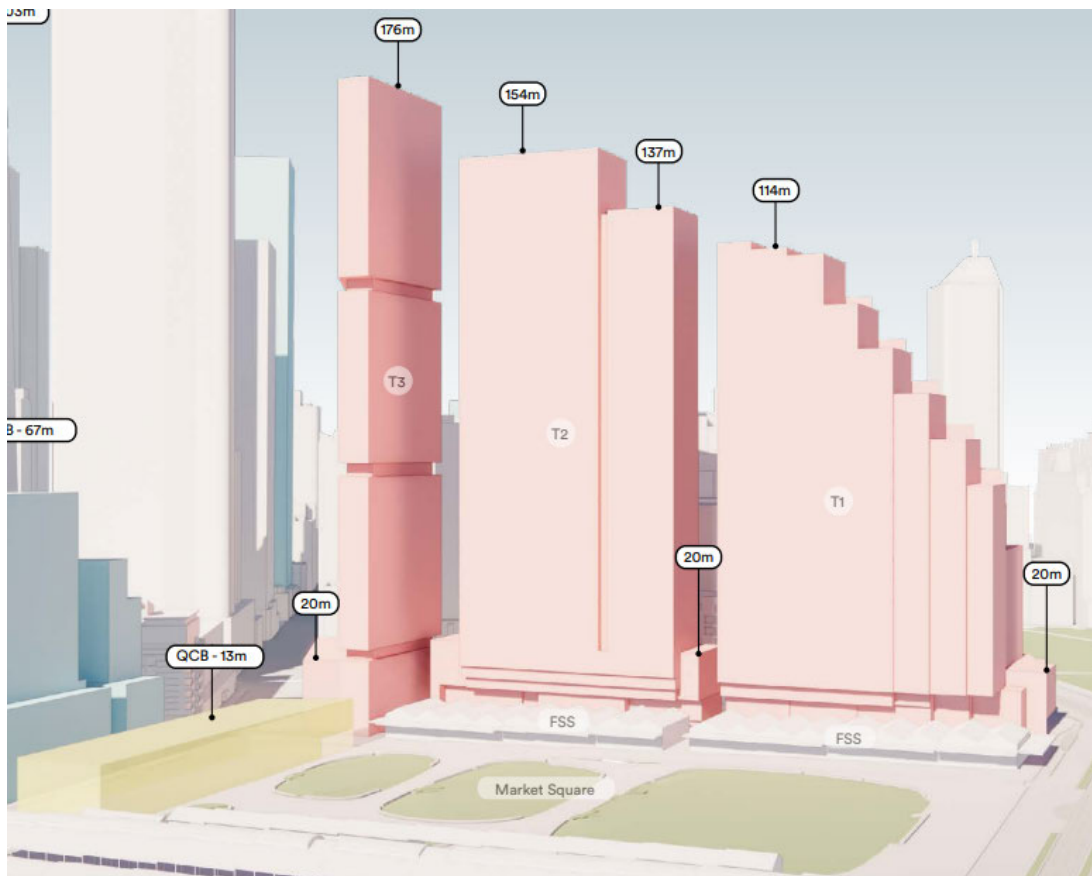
Diagram indicating the location of the various proposed buildings; Tower 1 (T1), Tower 2 (T2); Tower 3 (T3), Queens Corner Building (QCB) and Market Square. (Source: Development Plan, Lendlease)
